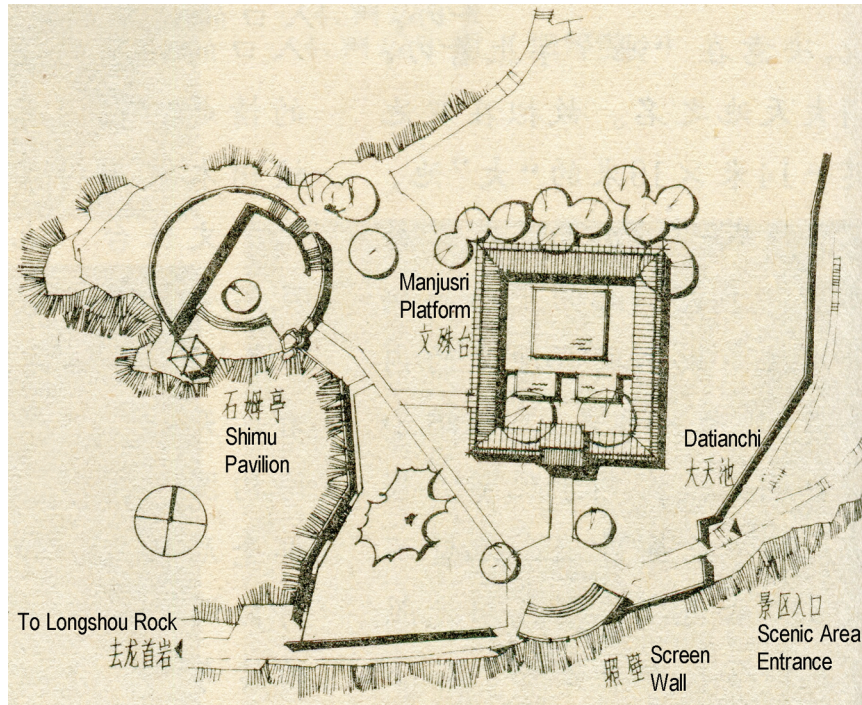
Site plan of scenic spots at Datianchi in Mt. Lushan.<sup>62</sup>
